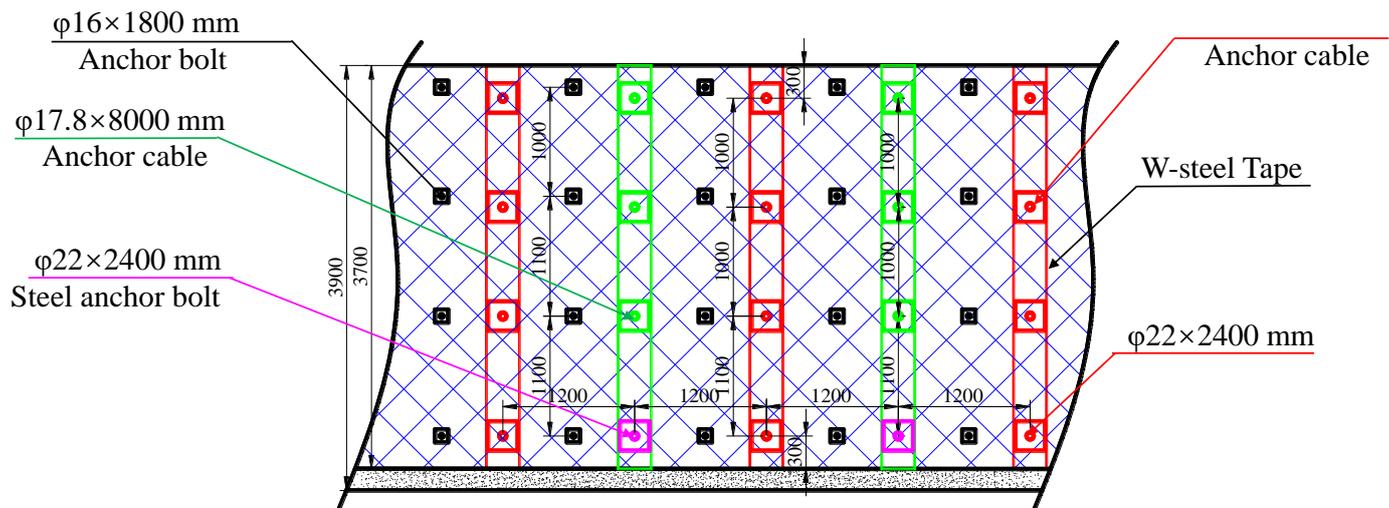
Secondary reinforcement and support of auxiliary wall of main retracement roadway.
